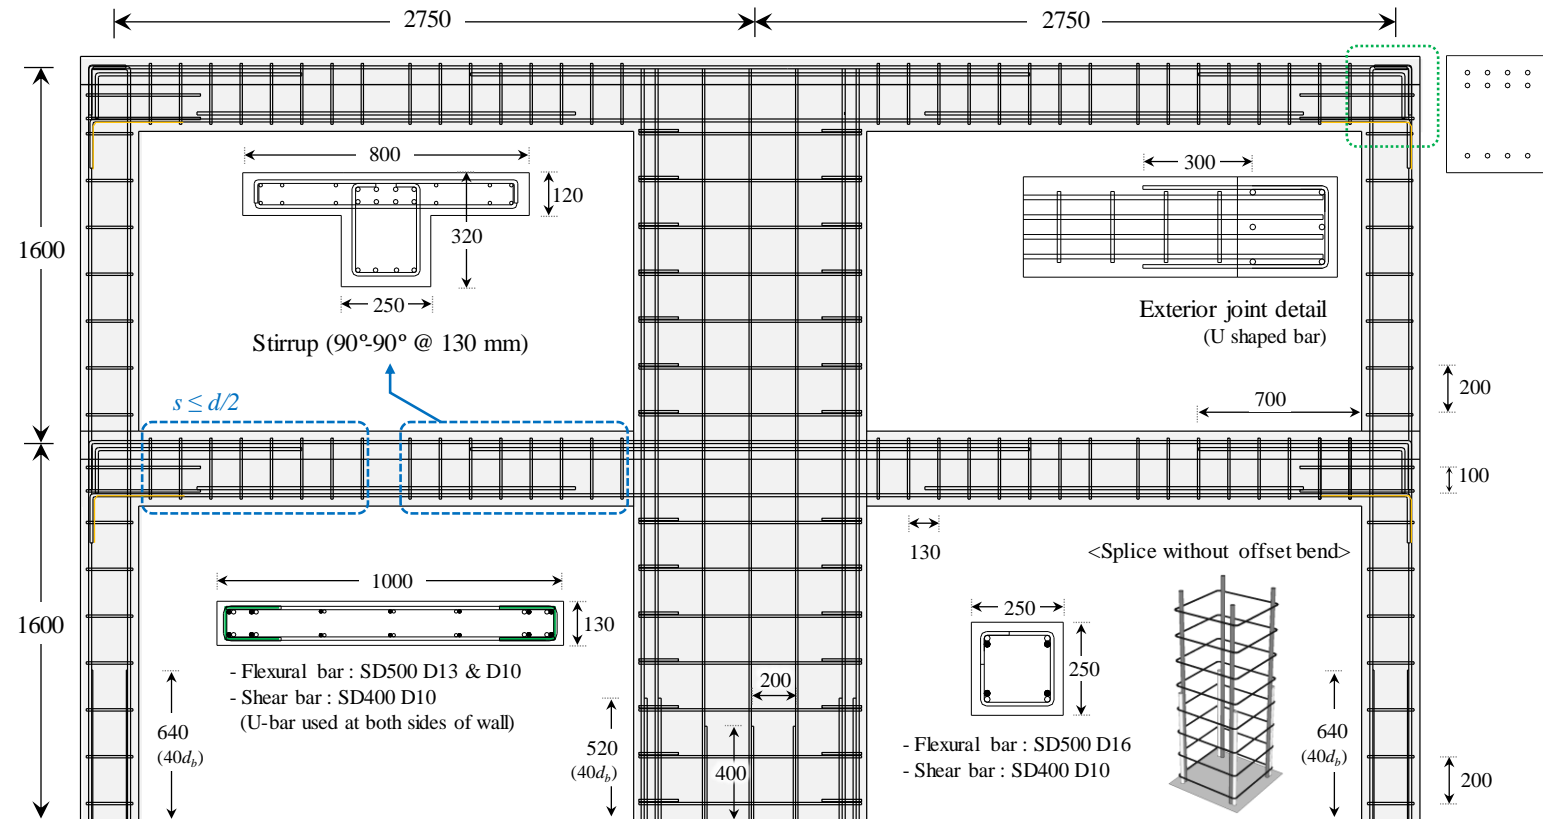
Dimensions and reinforcement details of the intermediate moment frame specimen (WF)
